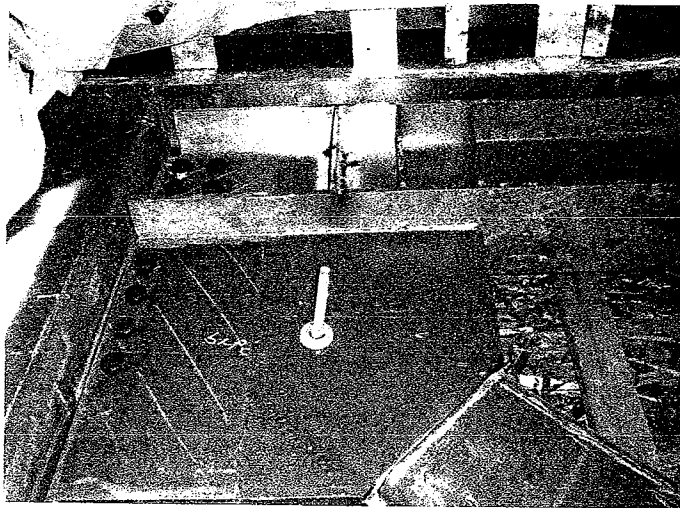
Stiffener plates welded to beam above brace gusset plates.
